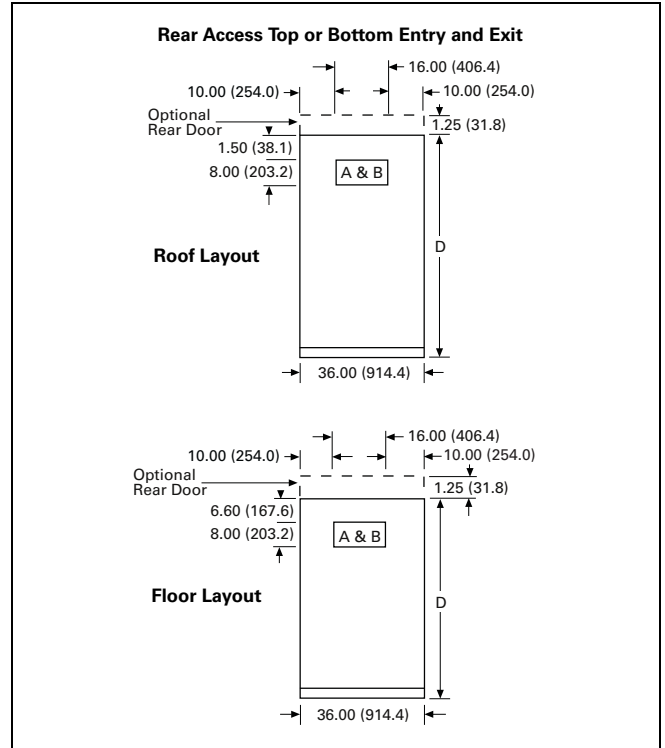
5 kV and 15 kV Roof Layouts and Floor Layouts
